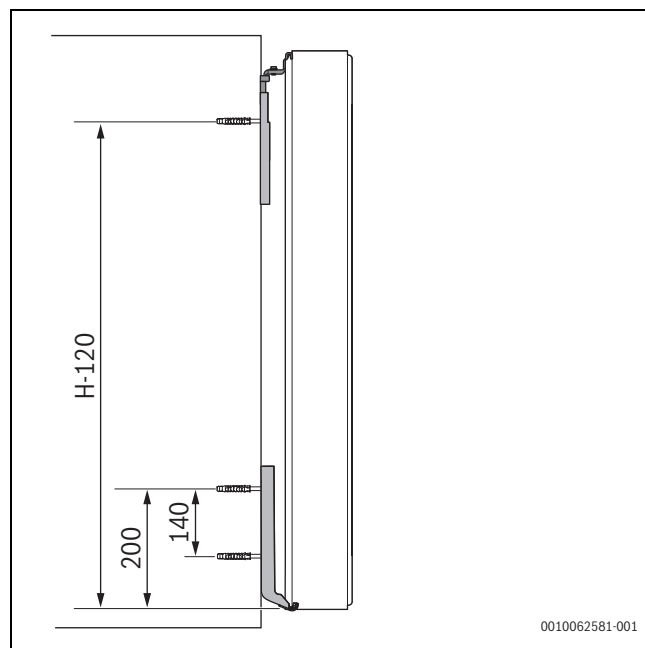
Bore hole dimensions for radiator brackets F7 for CV type 20, 21 and 22
